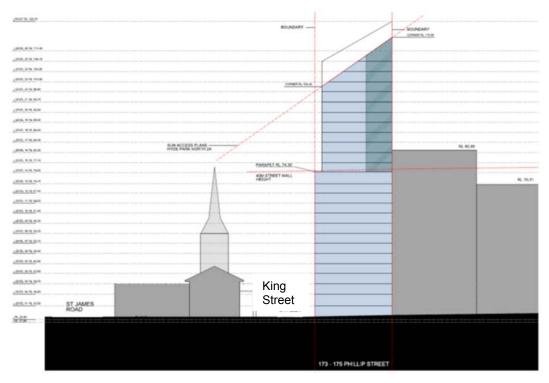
Eastern (Phillip Street) elevation of the proposed envelope.
